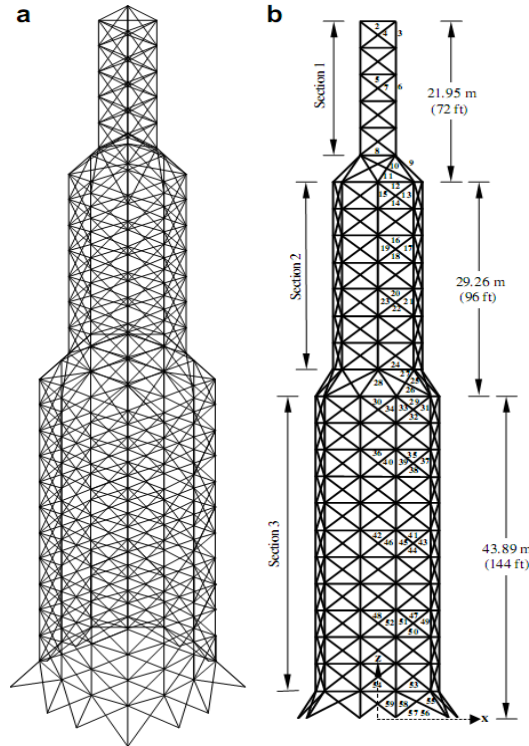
The 26-Story, 942-bar space truss tower: (a) 3D view, and (b) Side view
